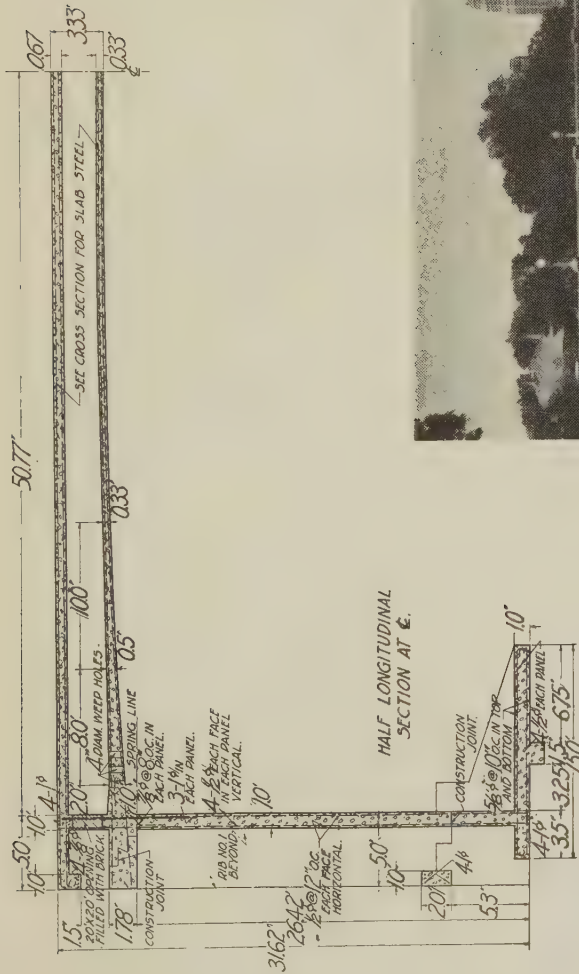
DETAILS, MARTINEZ STREET BRIDGE
